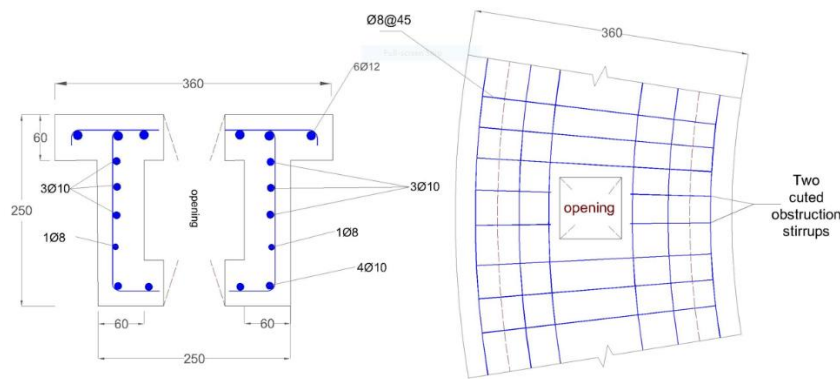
Details of cut of obstruction rebar at opening of specimens (CB2.V37- CB4.V82) (all units in millimeters)
